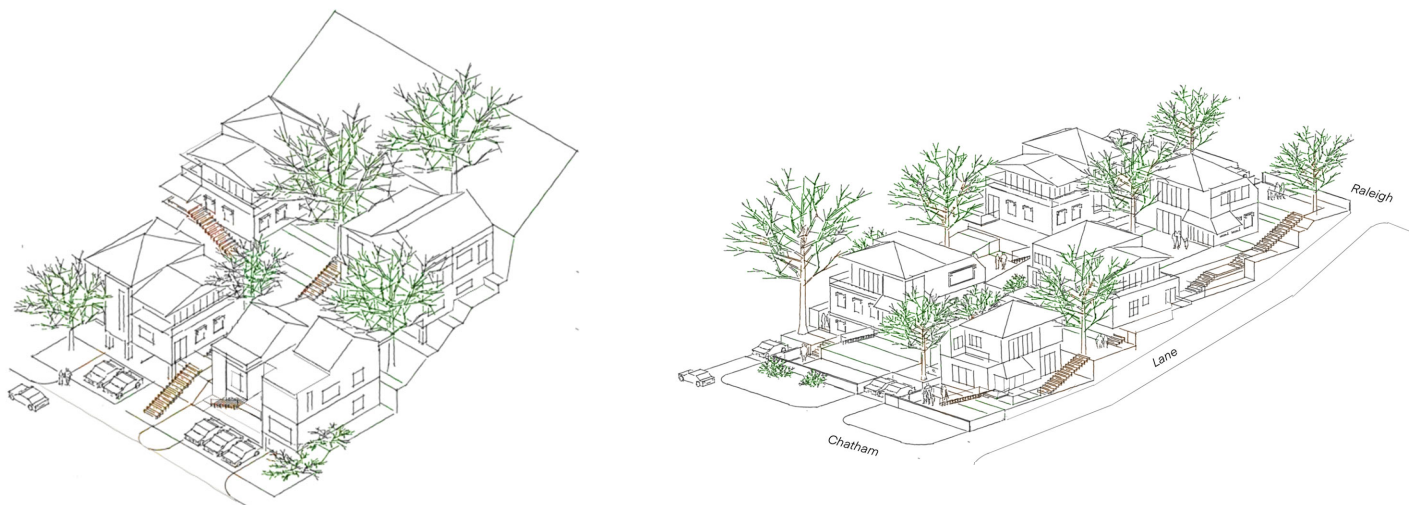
& 14. Sample illustration of 4 or 5 cottage/small home infill units on 2 steep sloped lots on the hillside, with off-street surface parking.
